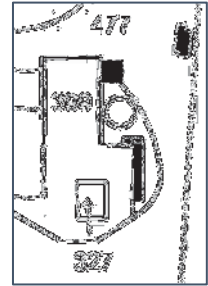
UHF / VHF Receiving Building and hybrid tower (415)
